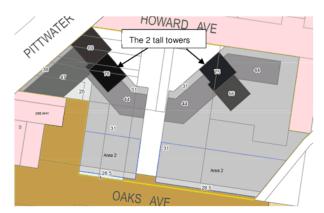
Current LEP Height of Buildings Map – the proponent seeks for external ancillary structures (e.g. plant, lift overruns etc) to be permitted anywhere on the site except for above the two tallest building forms marked by
